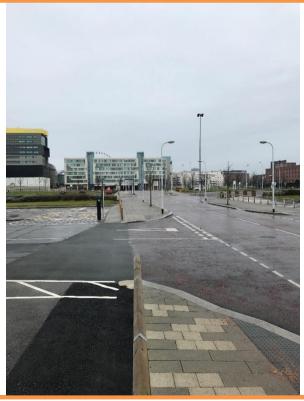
LOOKING NORTH ACROSS THE SITE
